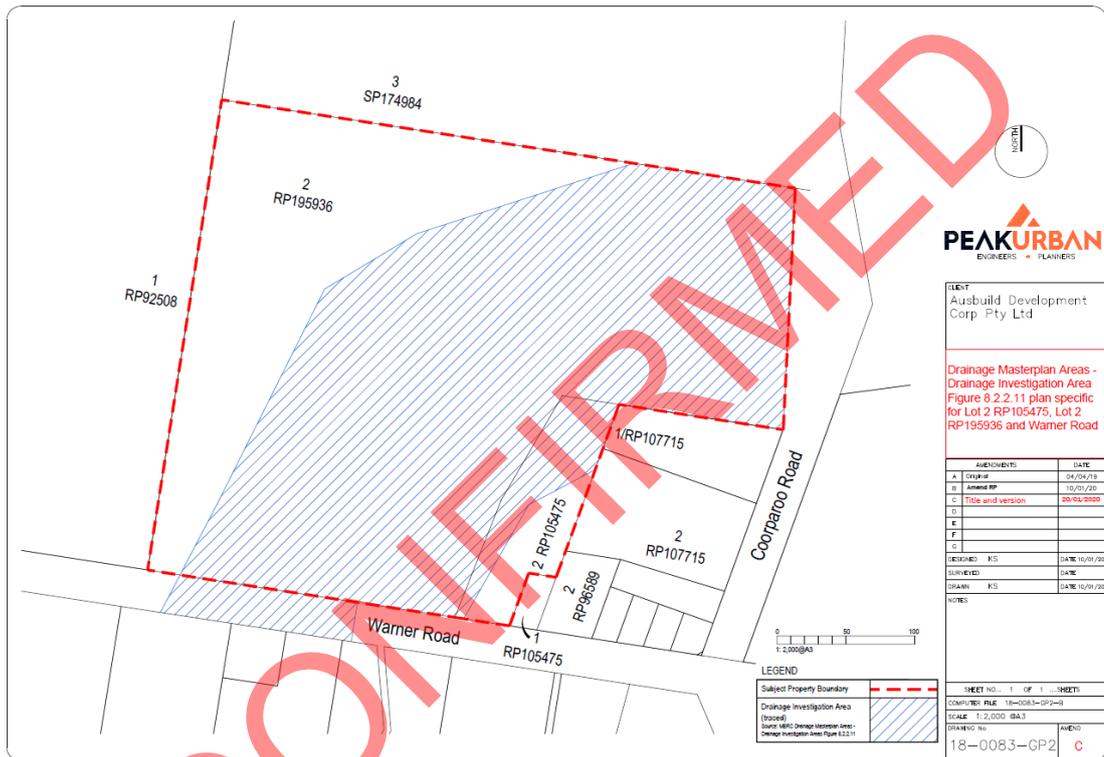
Proposed Drainage Master Plan (Peak Urban, 2020)
